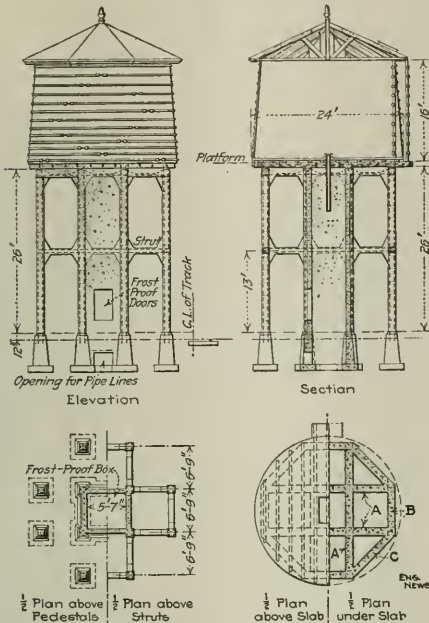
STANDARD REINFORCED-CONCRETE TOWER OR SUBSTRUCTURE FOR 50,000-GAL. WATER TANK; ERIE R.R.
